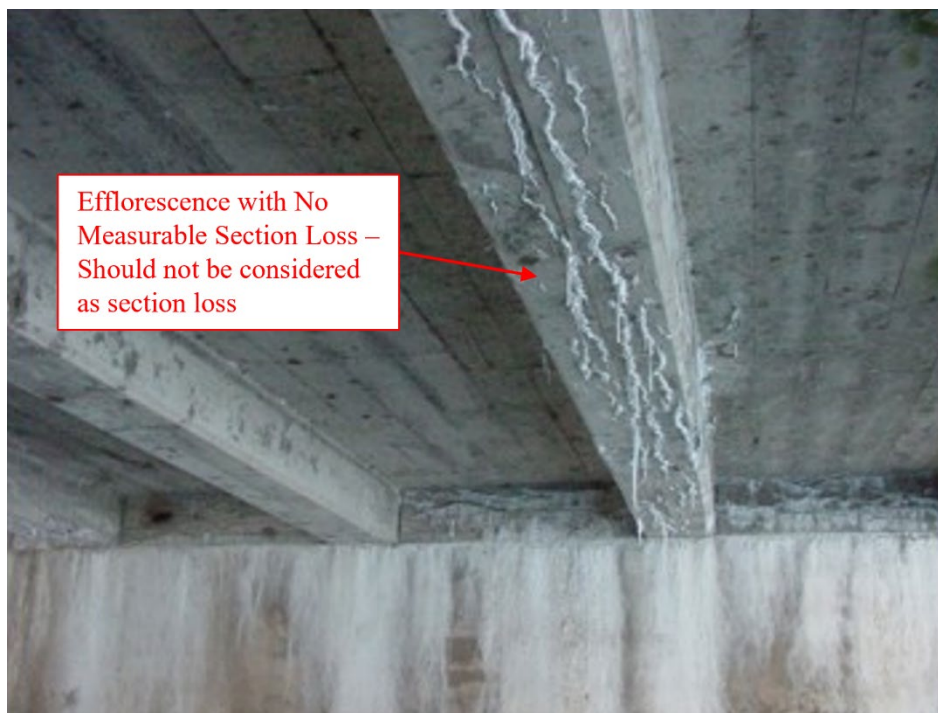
Reinforced Concrete T-Beam with Efflorescence and No Measurable Section Loss
